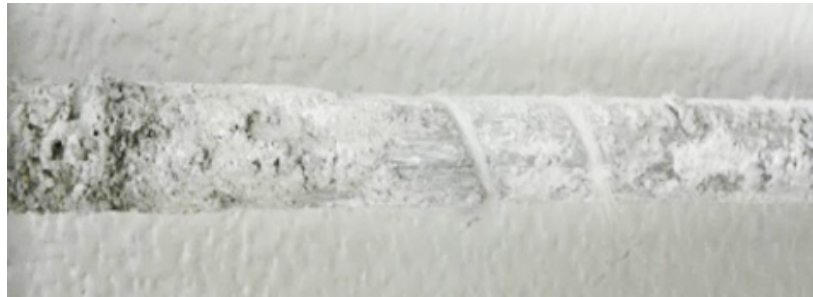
Rebar Surface Failure on American Fiberglass Sand-coated Specimens
